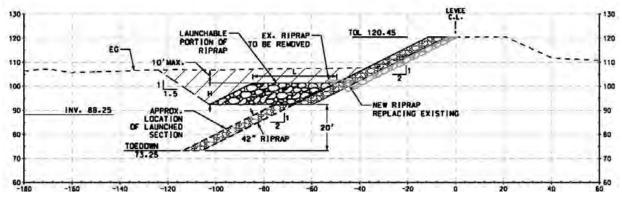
Typical Cross Section of Alternative D2 (Sta. 368+00)
